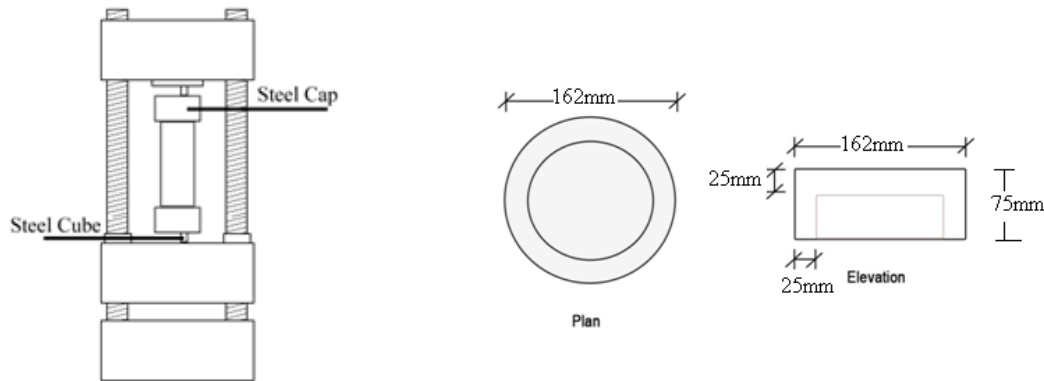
Testing arrangement for applying eccentric load on the specimens.
